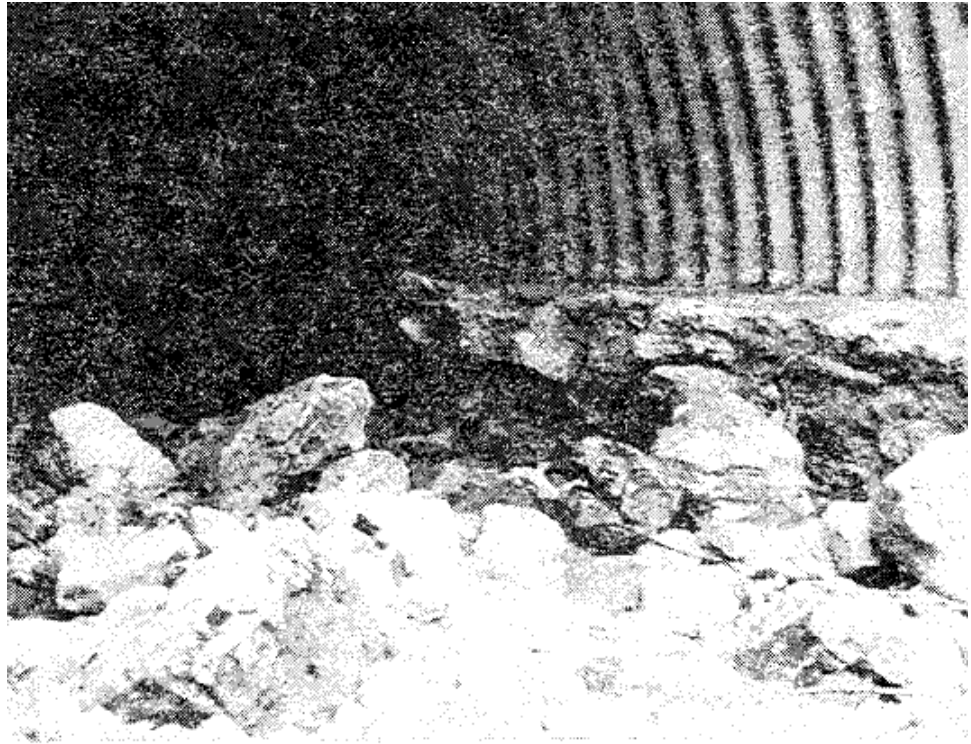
(Exhibit 78) Erosion of Invert Undermining footing of Arch
